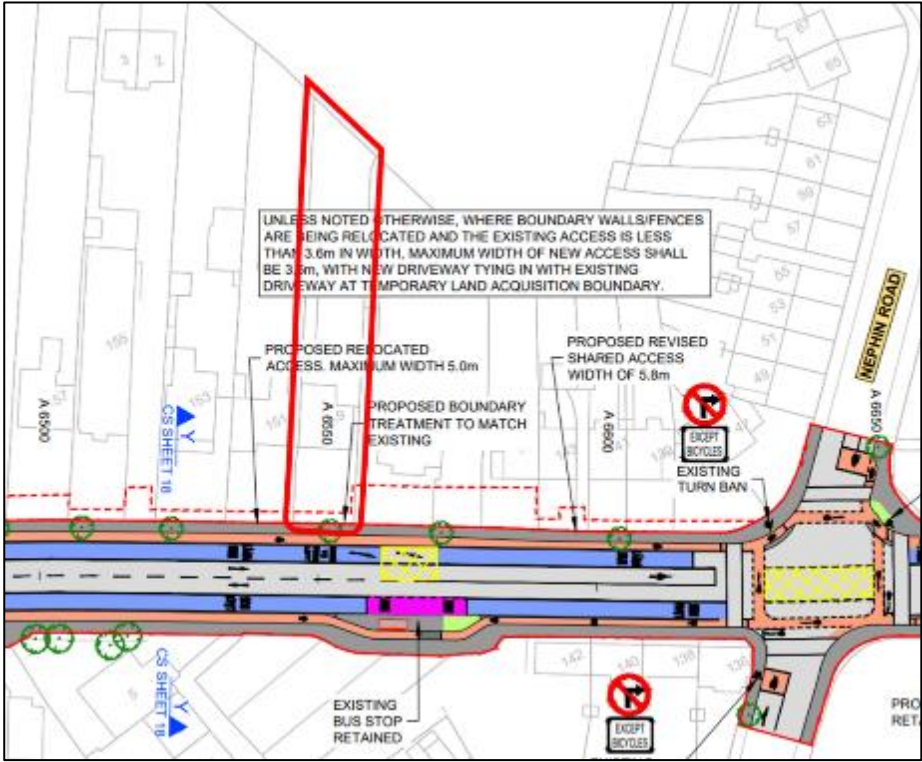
Proposed new Layout at 149 Navan Road
